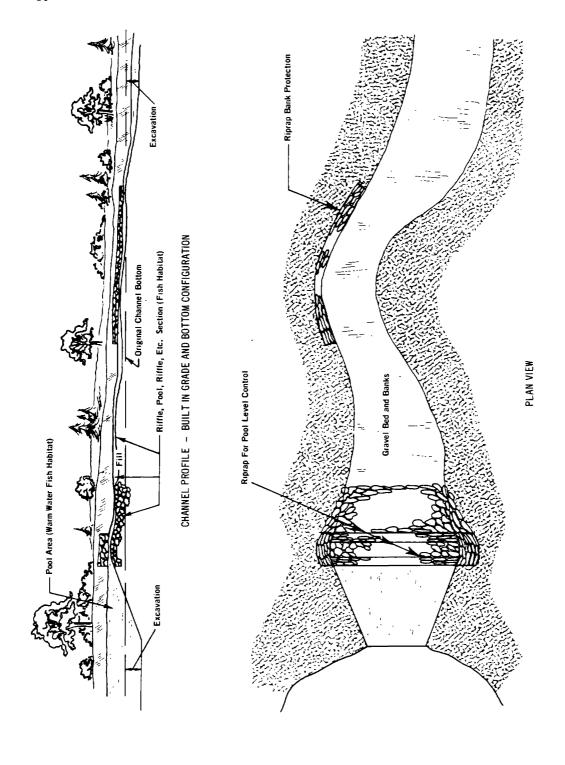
CHANNEL SEGMENT WITH POND, RIFFLE, POOL LAYOUT
